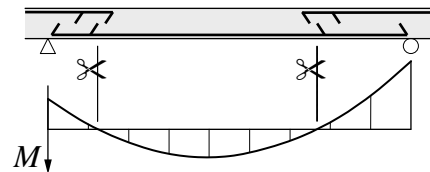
Bending moments and cutting location in a continuous concrete beam
